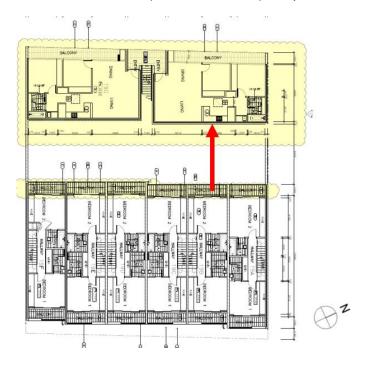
approved floor plans for dwellings at 19 William Street showing balconies facing blank walls opposite
